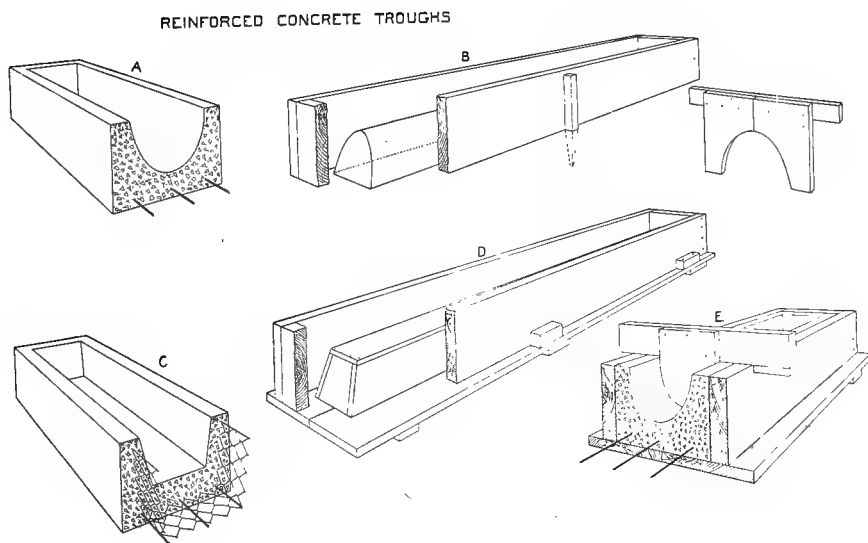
Concrete Troughs suitable for use in concrete hog houses.
